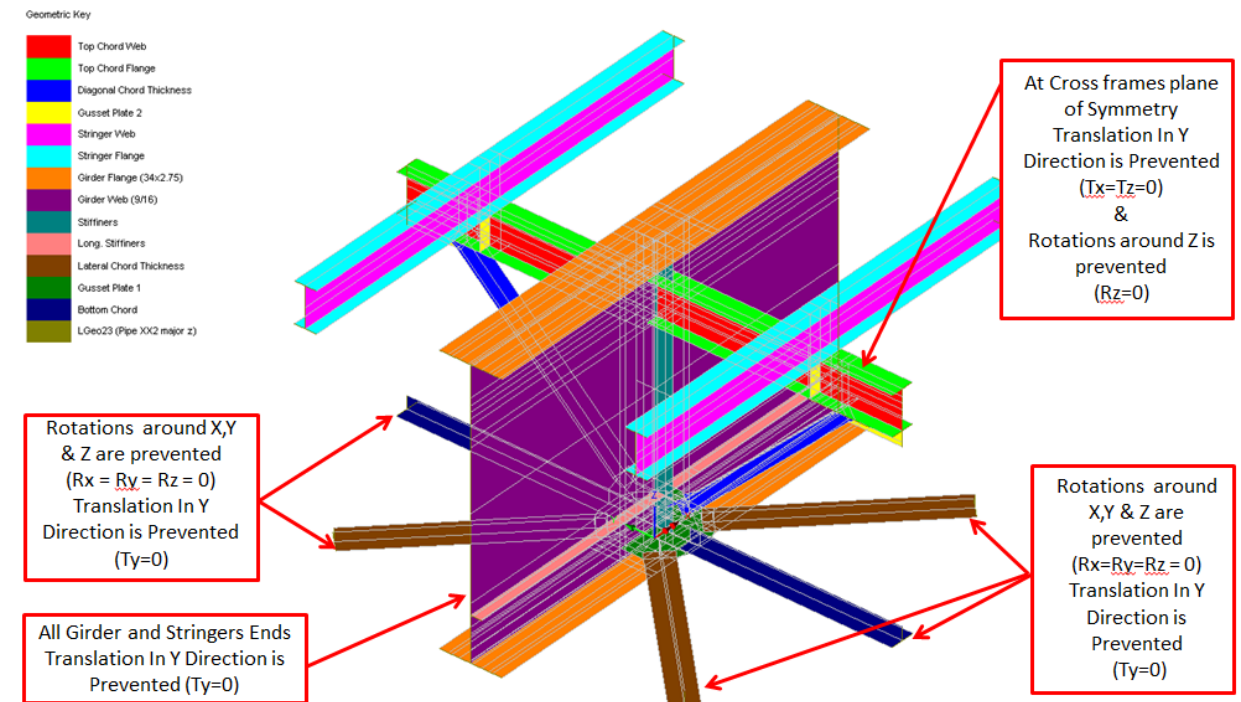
Boundary Conditions of the Interior Girder Sub-Model
